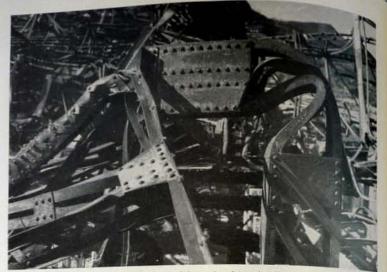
Group 35, Building 1. Looking north at Columns 3 and 4, and at Truss B between Column Ross 2 acr
